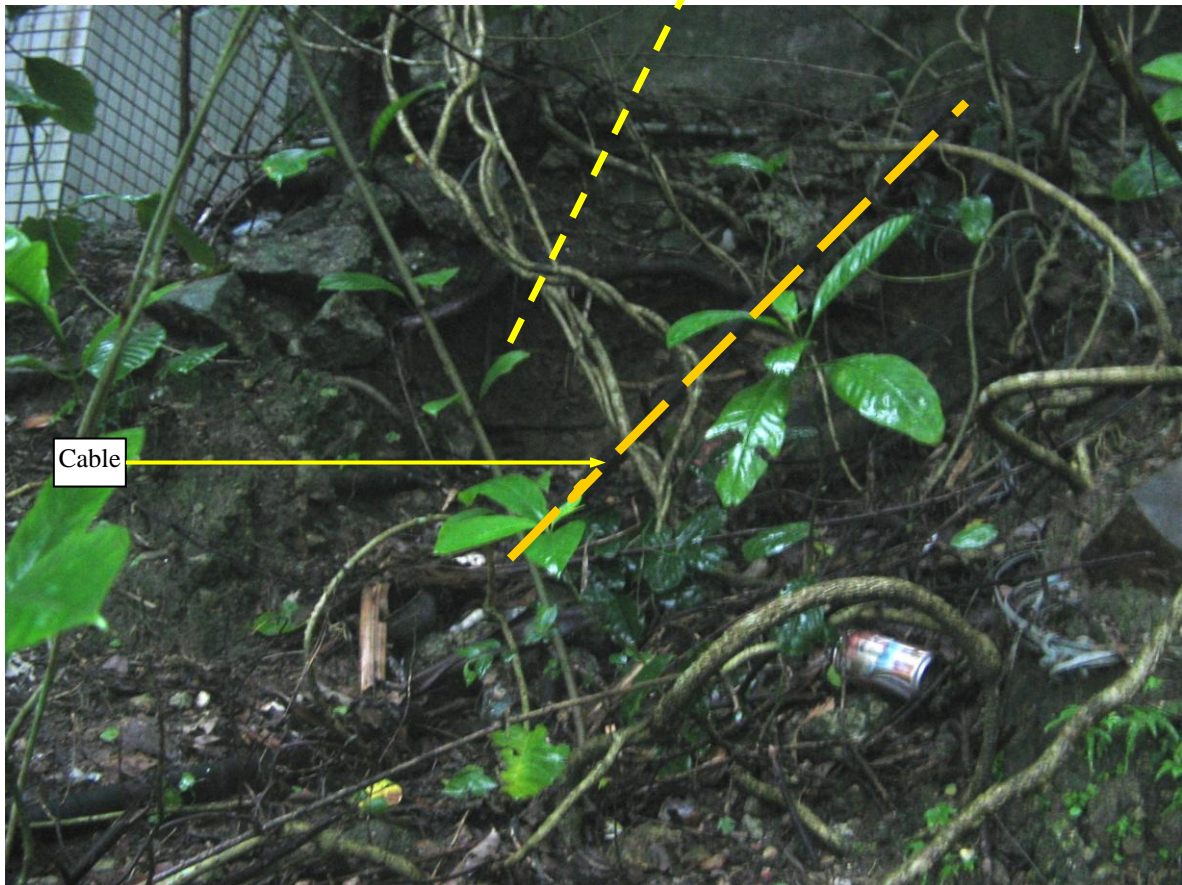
Small Excavation at the Crest of the Hillside below the Entrance to House A of No. 84 Peak Road
